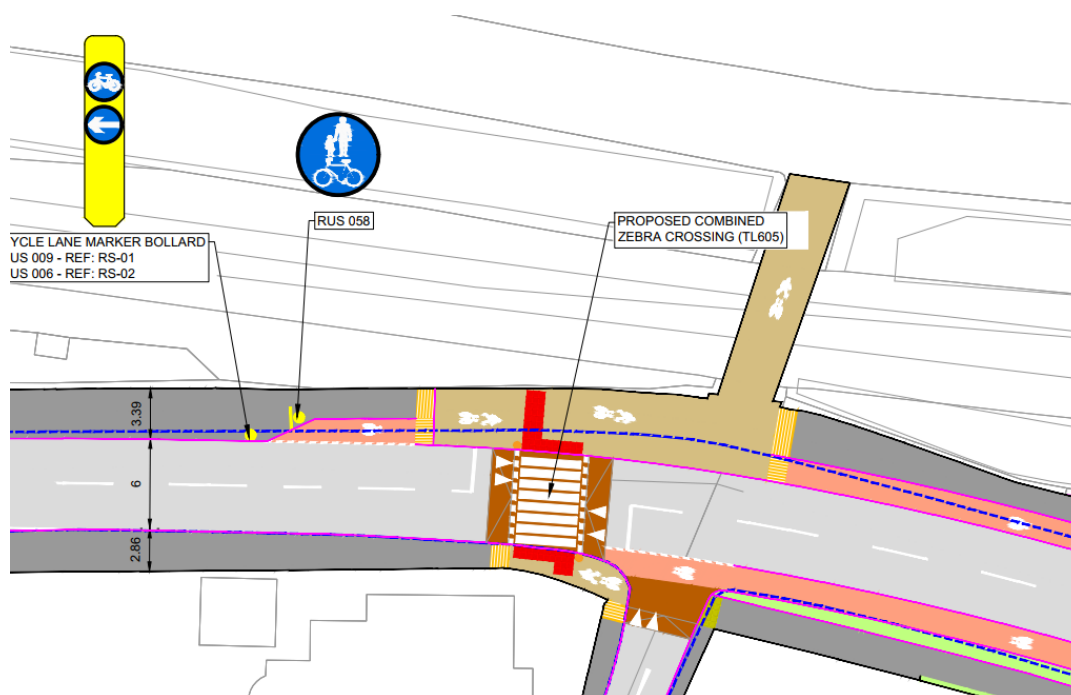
Proposed Mixed Traffic Transition on Mill road at Park Lane Junction
